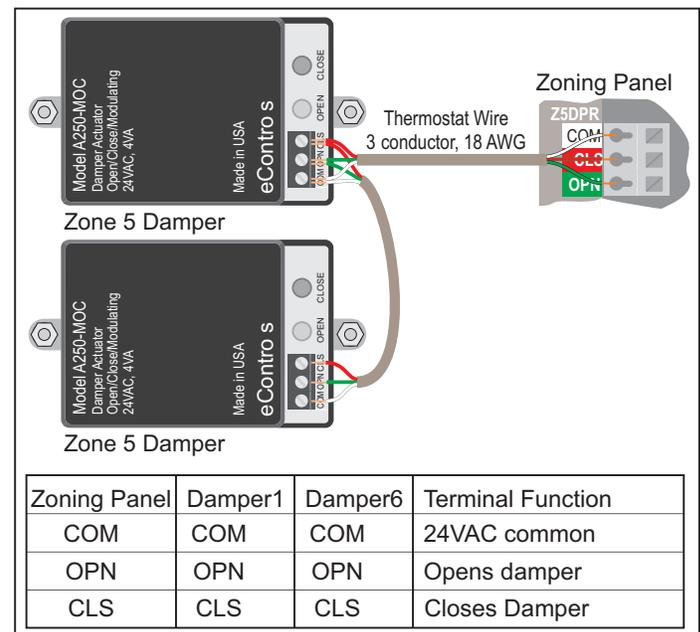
Wiring CRDA250 actuators when multiple dampers are used to form a zone.
